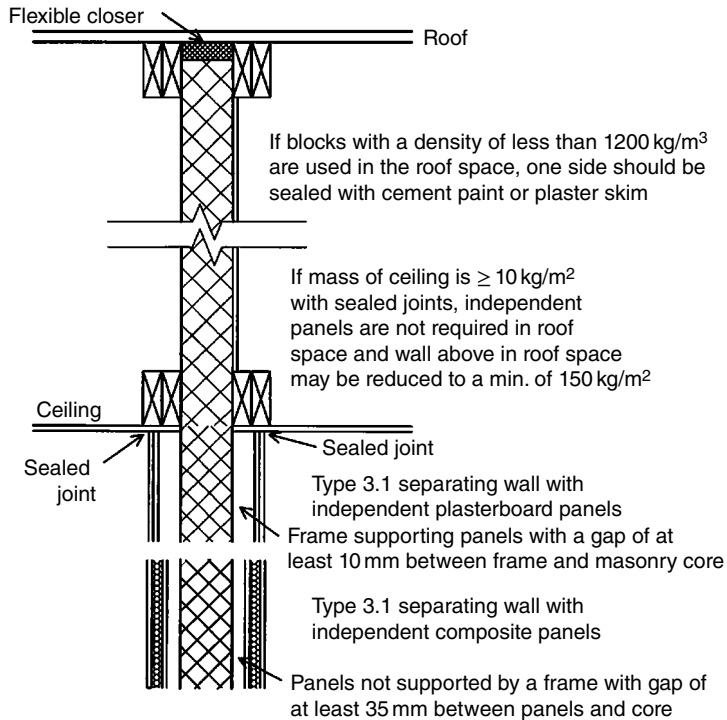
Roof junction using wall Type 3.1 or 3.2, assuming roof space is not a habitable room.
